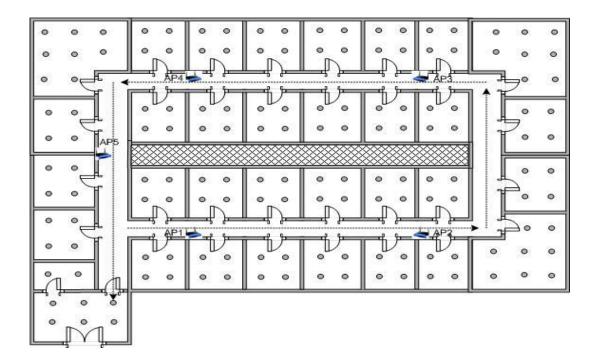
Distribution of Access Points and Reference Points on the Building Layout
